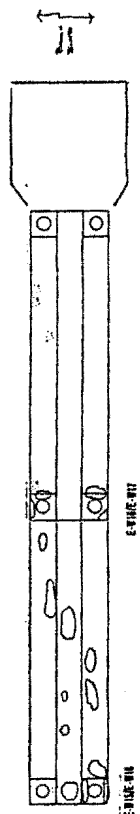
Sectional Elevation of P&H and S&P Sections of Pier
